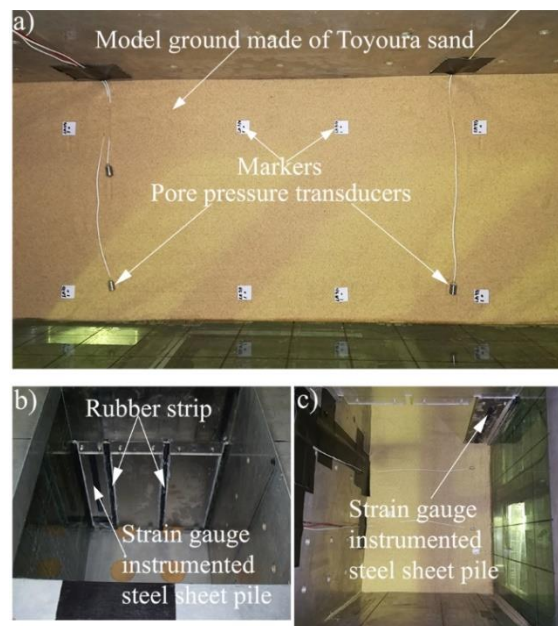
Preparation of model ground; a) placement of sensors inside the ground, b) installation of sheet pile for continuous sheet pile, and c) installation of sheet pile for limited width sheet pile.
